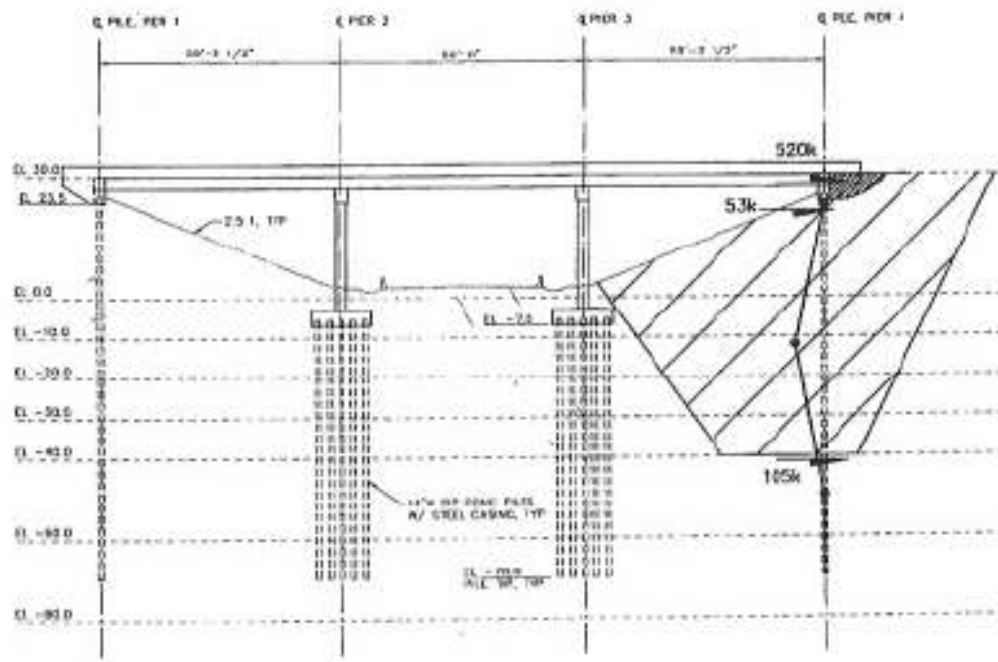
Plastic Hinge Location along the Pile, Missouri Bridge, Pier 4
